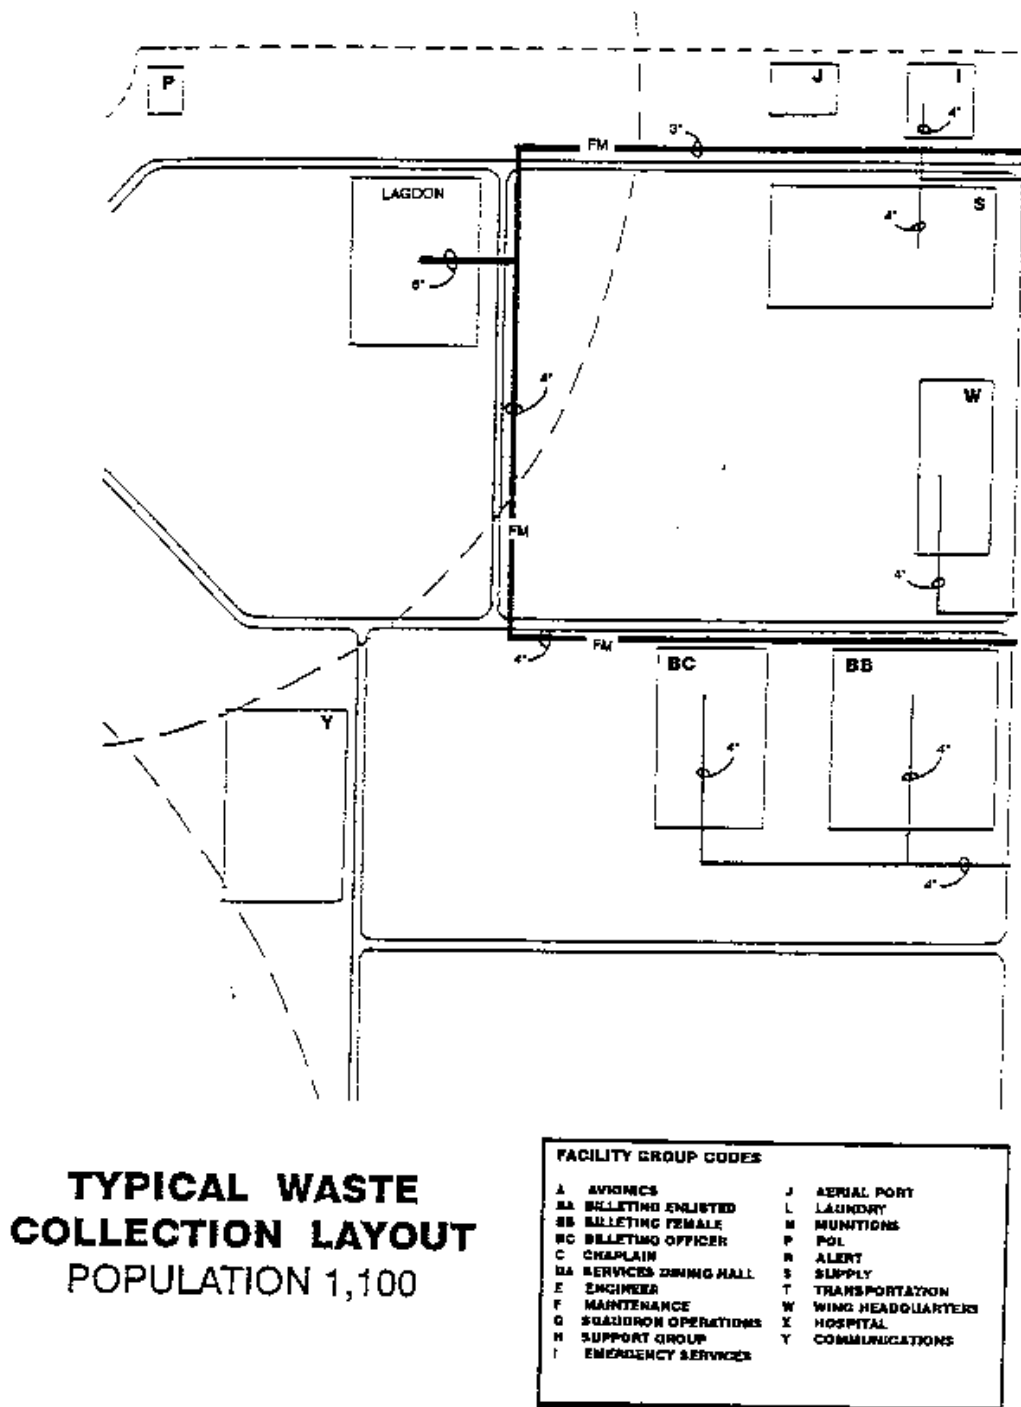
Waste Collection Layout - 1,100-person (continued).
